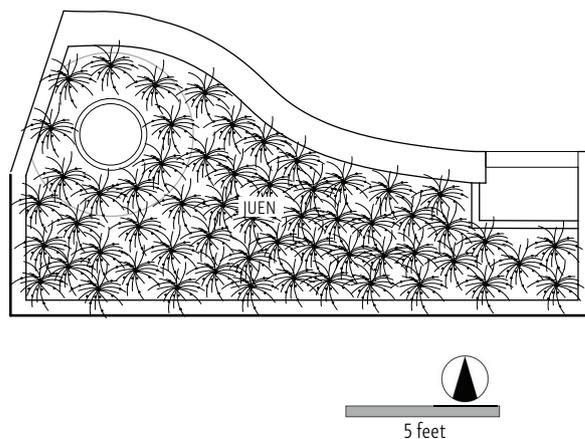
Minimal planting plan on SE corner plan to be a control for possible planting experimentation
